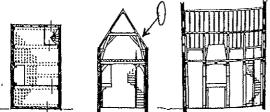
Reconstruction of Breedstraat 32, Enkhuizen, Holland ca 1540.
